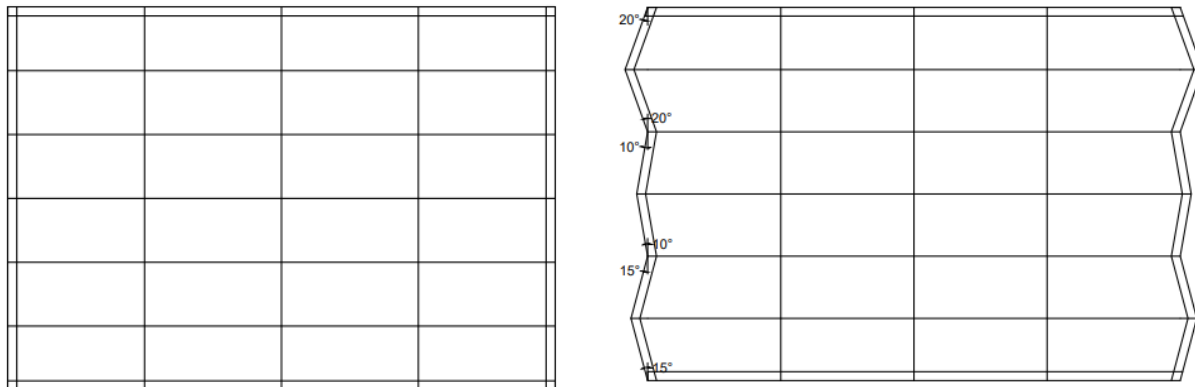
(a) Orthogonal connections, (b) Out-of-plane skewed connections.
